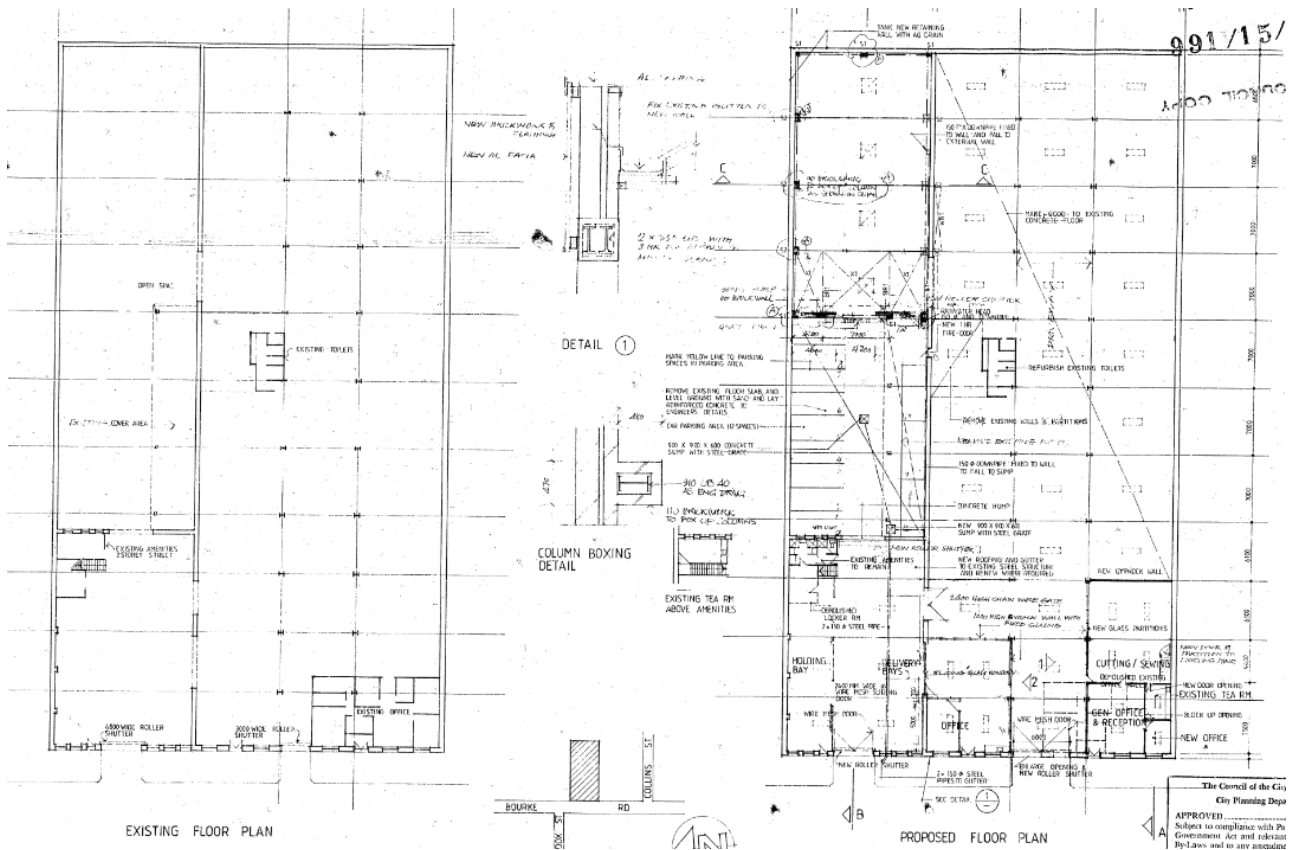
Detail from 1987 plans showing alterations to interior of subject site
